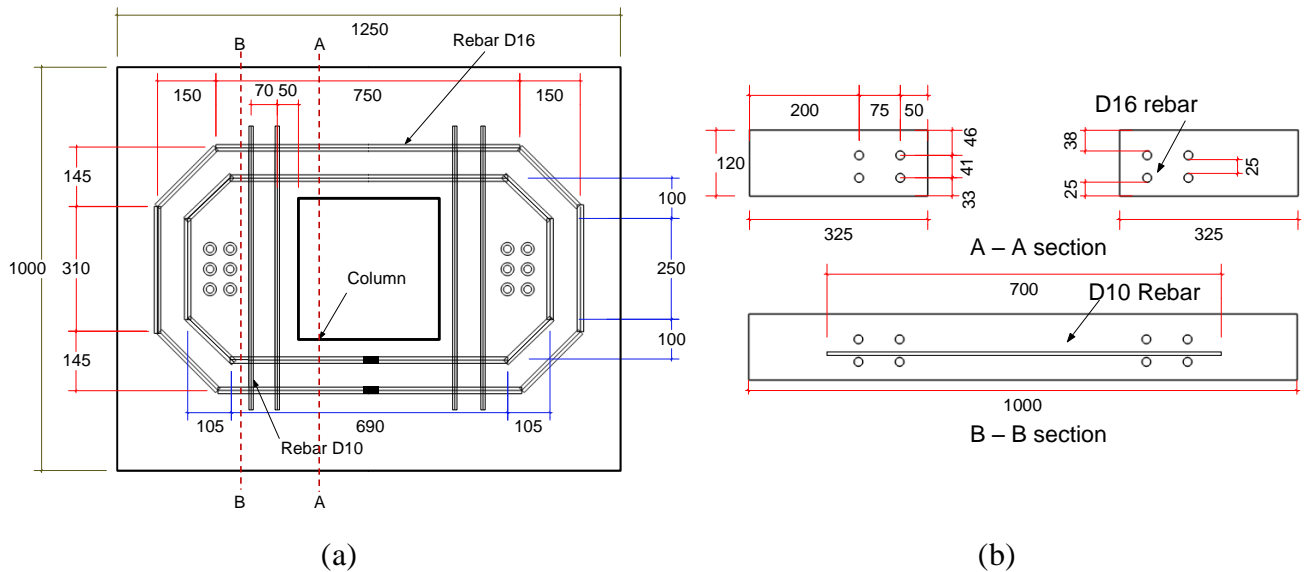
Details for slab and rebar in Specimens 'RC-1':
